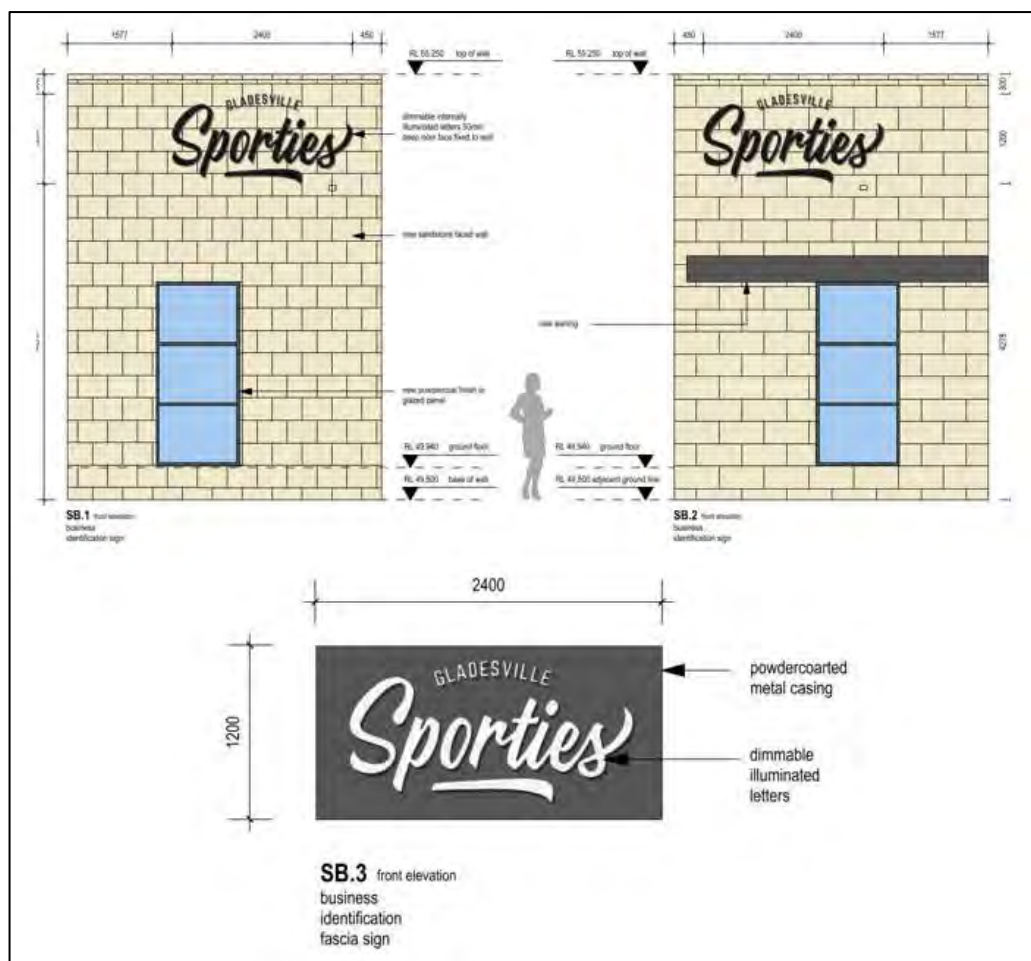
Proposed flush wall signage on Ryde Road frontage
